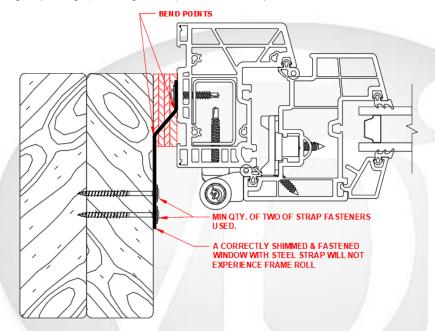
Example of Correctly Shimmed & Fastened Window with Steel Strap
